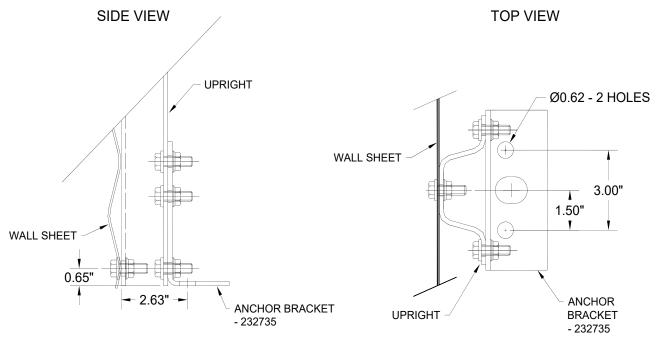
Upright, Wall Sheet and Anchor Bracket (232735)
